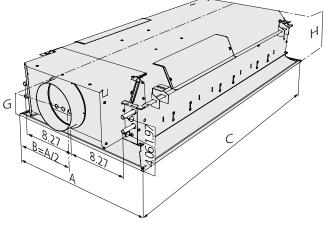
Dimensional drawing - short side connection (the length 4 ft.) with air connection on side 1 is shown in the example).
